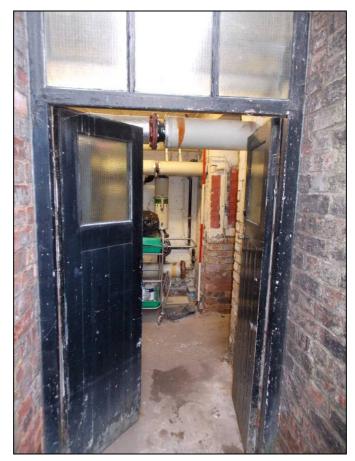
Doorway to the underground boiler room, looking south (scale 2m).
